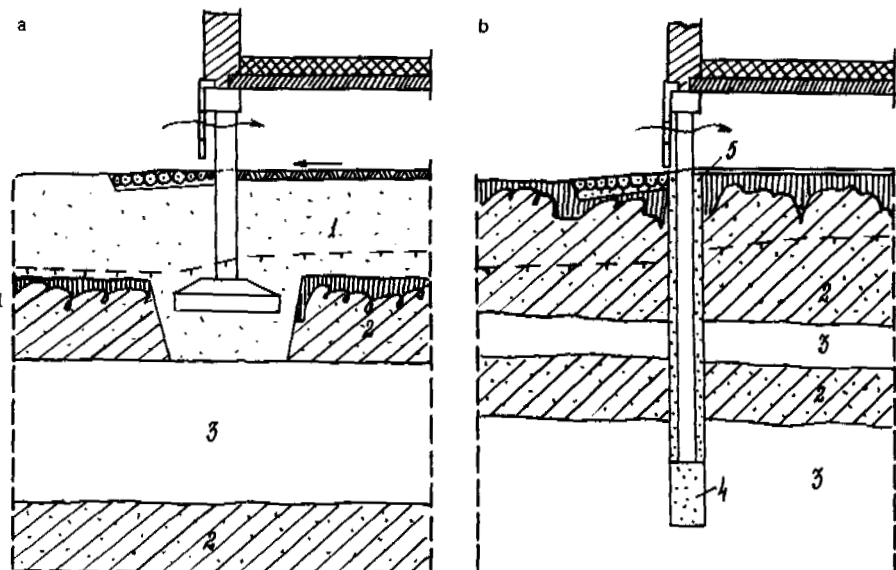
Layout of (a) columnar and (b) pile foundations on ground ice.
